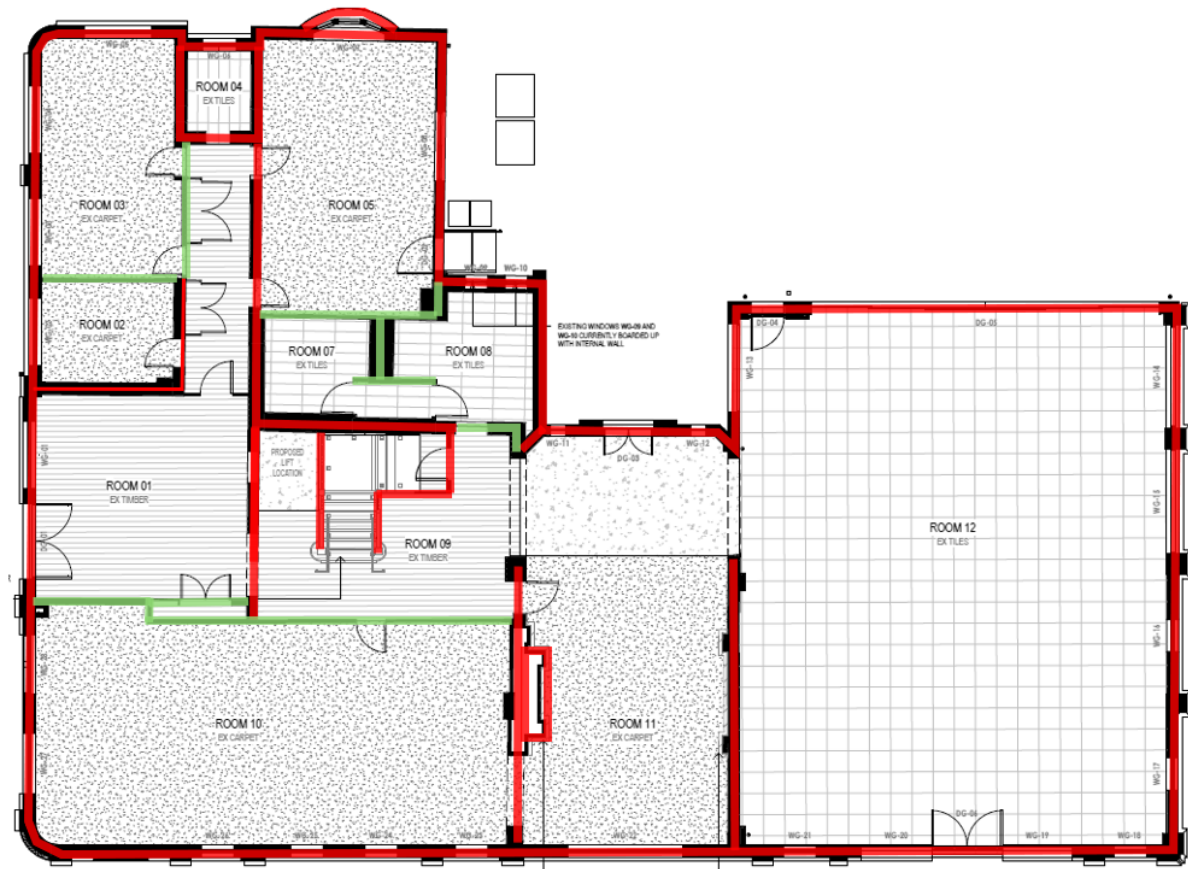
Existing ground floor plan showing layout of early or original walls in red (1909-1950), and later additions in green.
